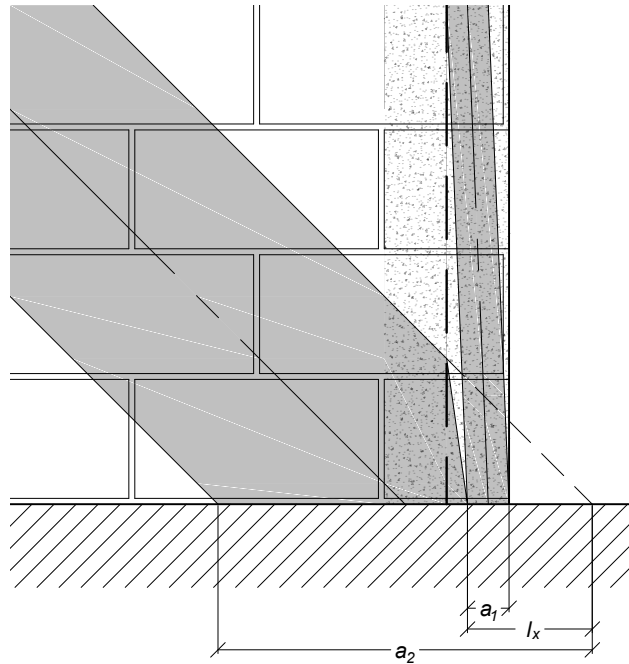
Toe extension of second strut in a partially-grouted wall
